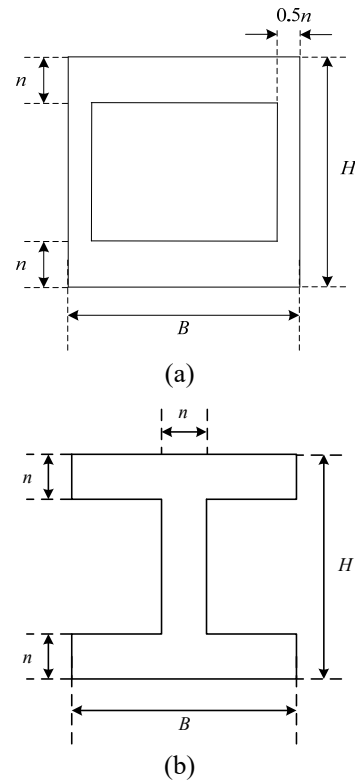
Cross section of the two beams: (a) hollow beam; (b) H-beam.
